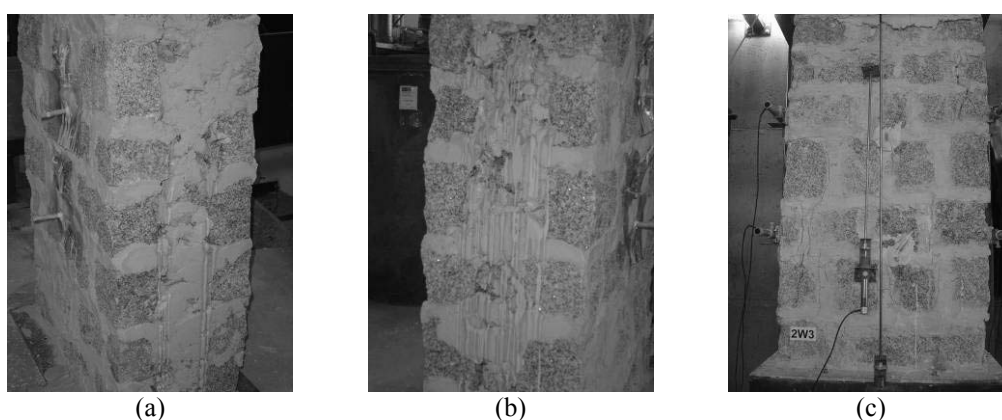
Transversal tying of a multi-leaf wall: (a) injection of the holes; (b) leakage of grout; (c) wall 2W3 under compressive loading.
